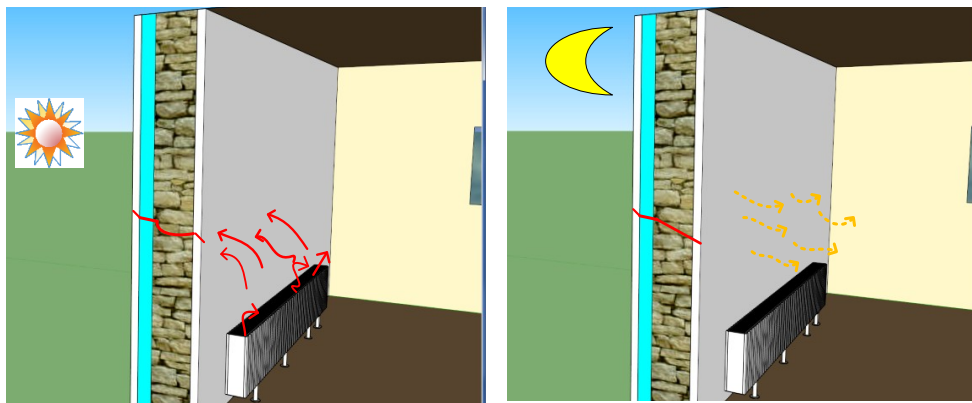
1: Illustration of thermal storage in the building's fabric construction
